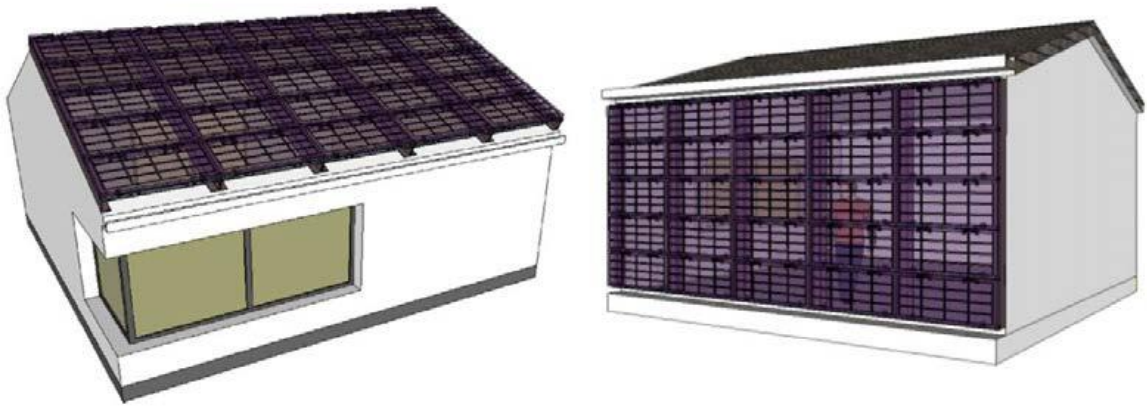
Architectural designs for BIPV elements in the roof and façade of a building
